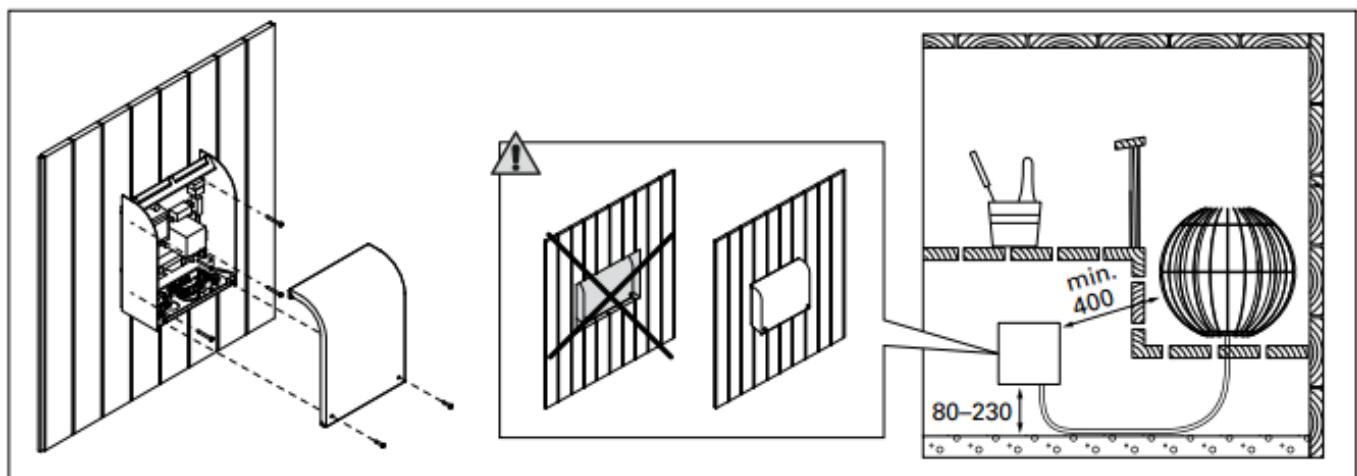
Installing the power unit (all dimensions in millimeters)
